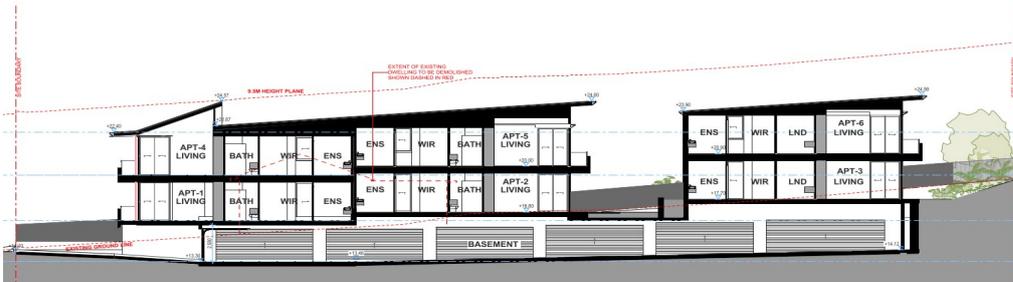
Extract of DWG 0628-DA112 01 (longitudinal section) showing 9.5m building height plane and building relationship
